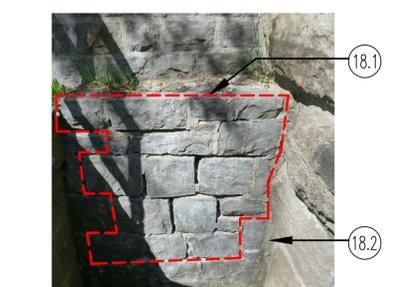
SCALE:NTS 18.1 MARK STONE, REMOVE, ANCHOR AND REINSTALL STONE TO MATCH EXISTING. 18.2 RAKE OUT AND REPOINT ALL REMAINING JOINTS AS PER ELEVATION 5/S05.
